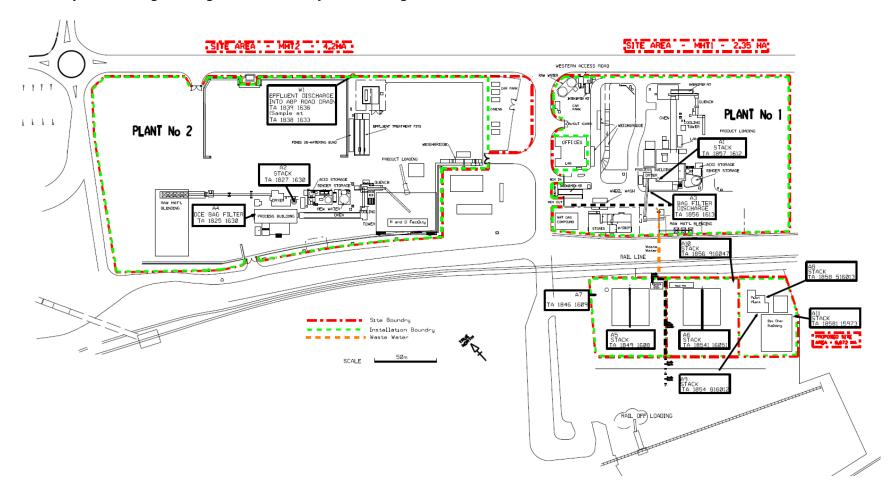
Site Layout showing Existing Permit Boundary and Existing Emission Points
